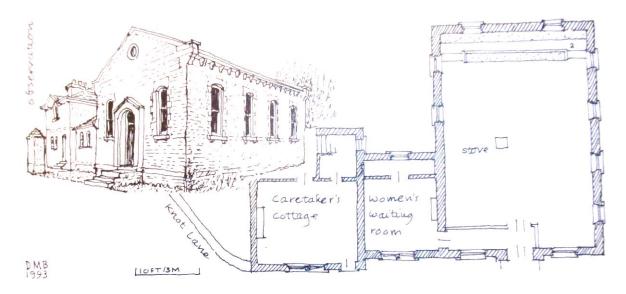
Ground floor plan (not to scale) and perspective prior to additions (North is to the right on the plan)
